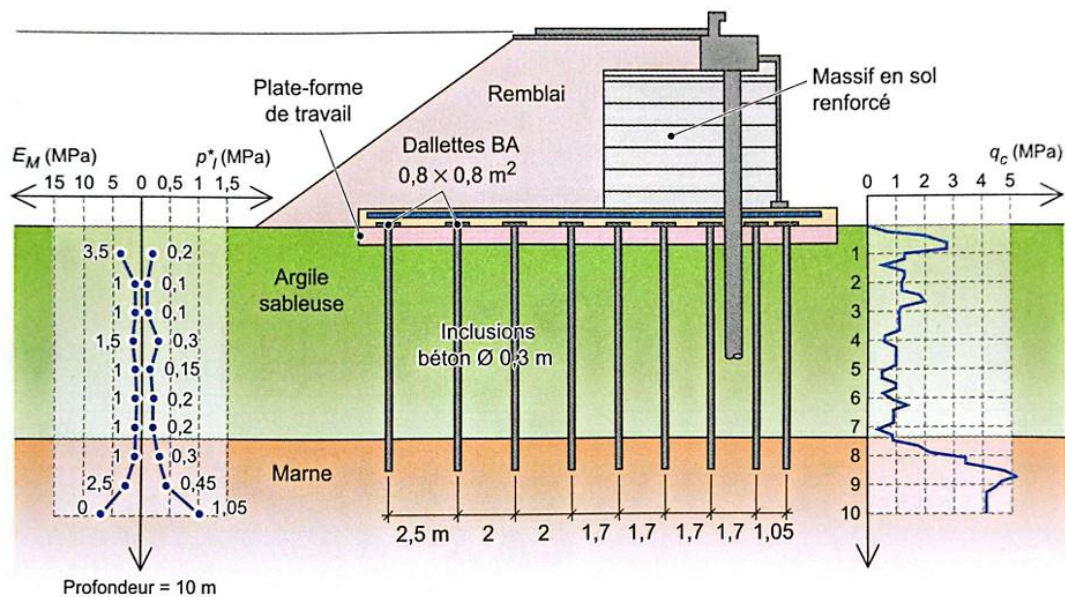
Access embankment to a bridge abutment constructed as a reinforced embankment mass
